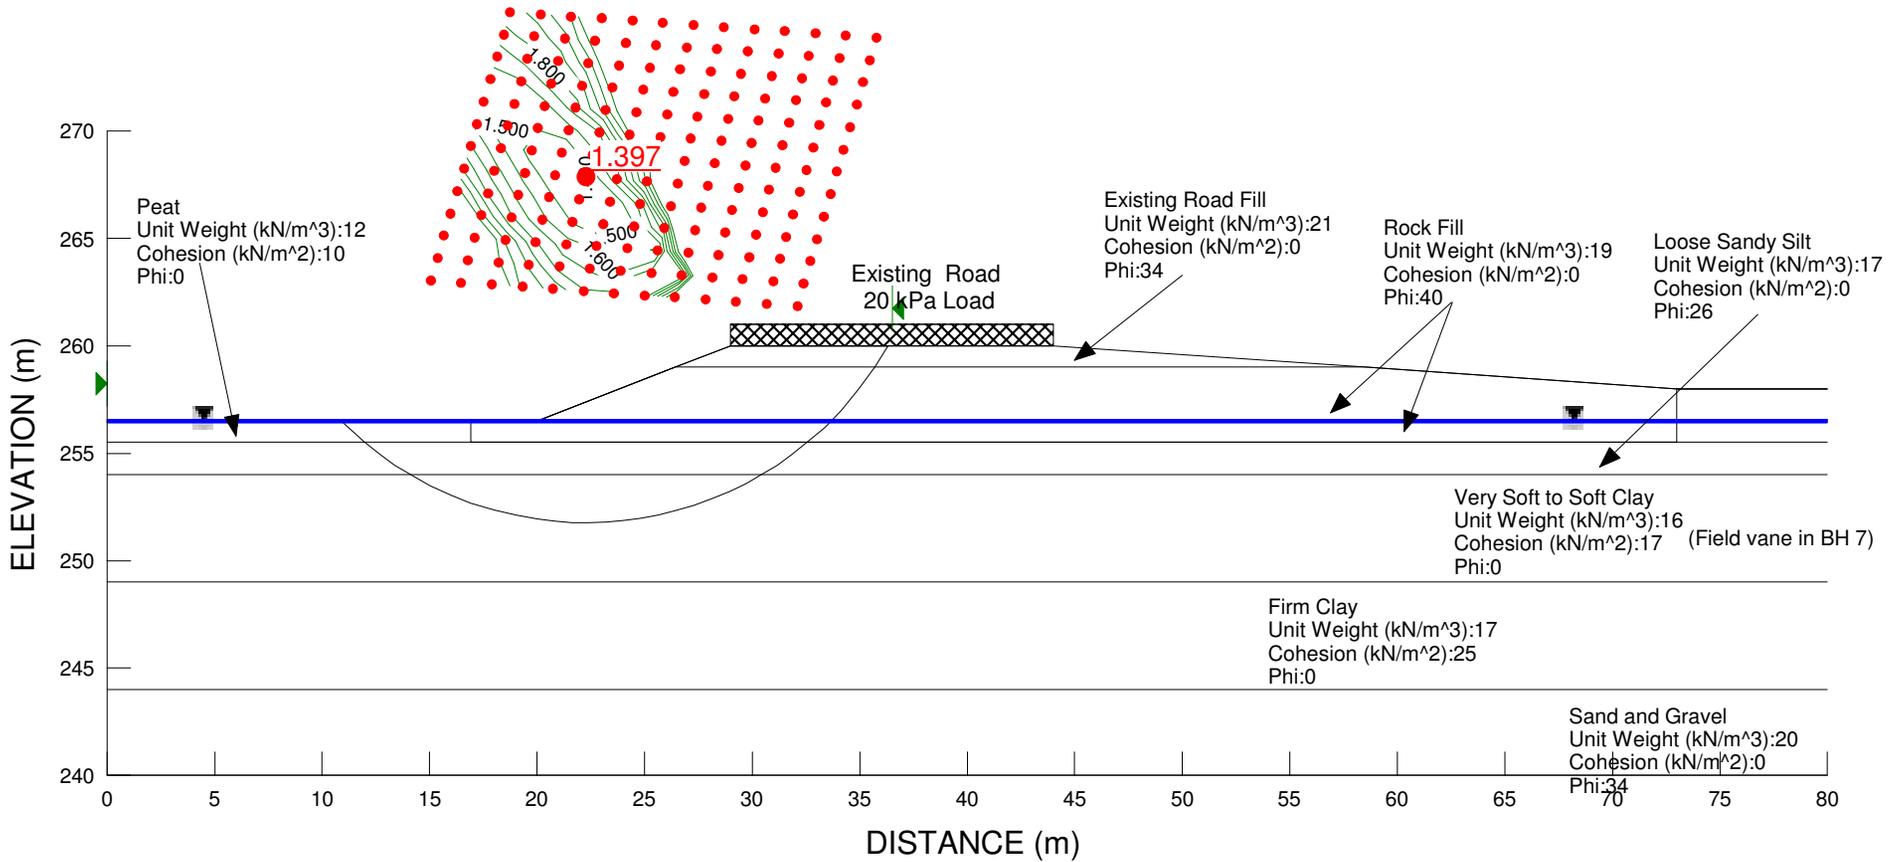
Slope Stability Analysis of Section at Station 18+875 - 3.0 m Road Widening (End of Construction - Slip Surface within Westbound Lane)
